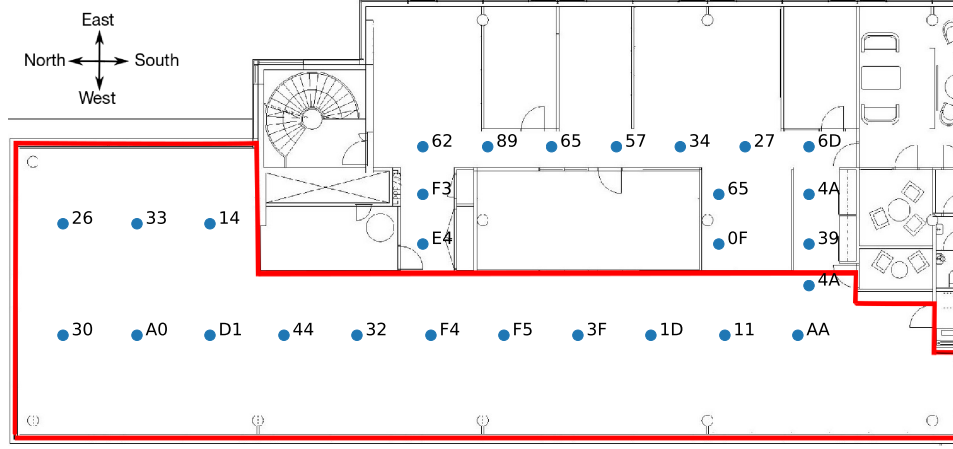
Floor plan of Helvar's R&D section in Keilaniemi office with the location of the beacons.
